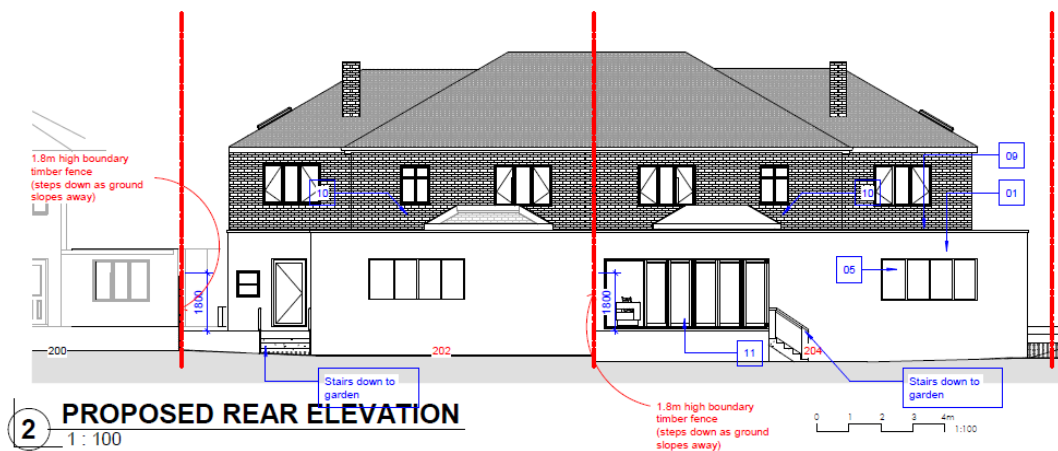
Proposed Rear Elevation showing proposed and permitted extensions
